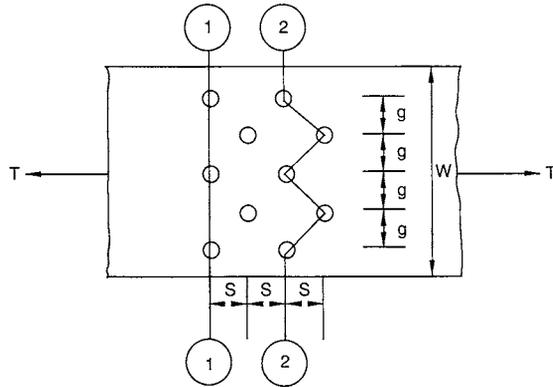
Chains of bolt holes used for determining the net section of a tension member.
